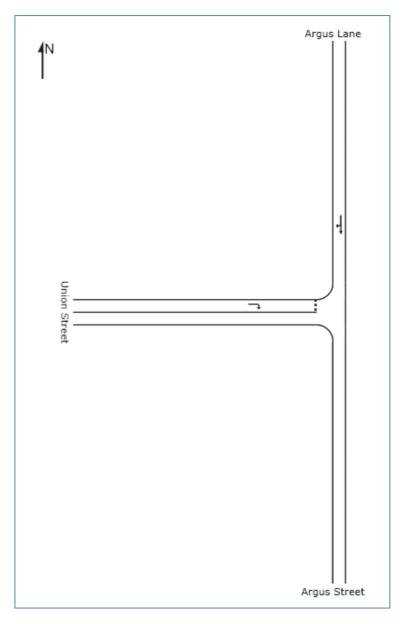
Existing Argus Lane/Union Street Intersection Layout
